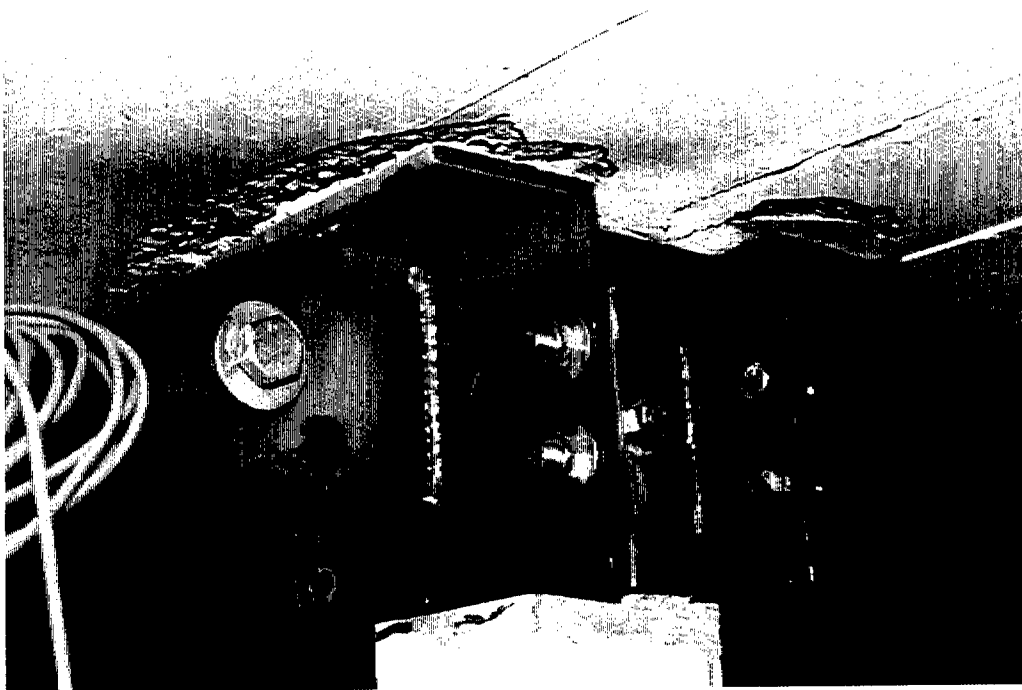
Bottom of Third Floor Slab, East Center Column, Post-E200N
